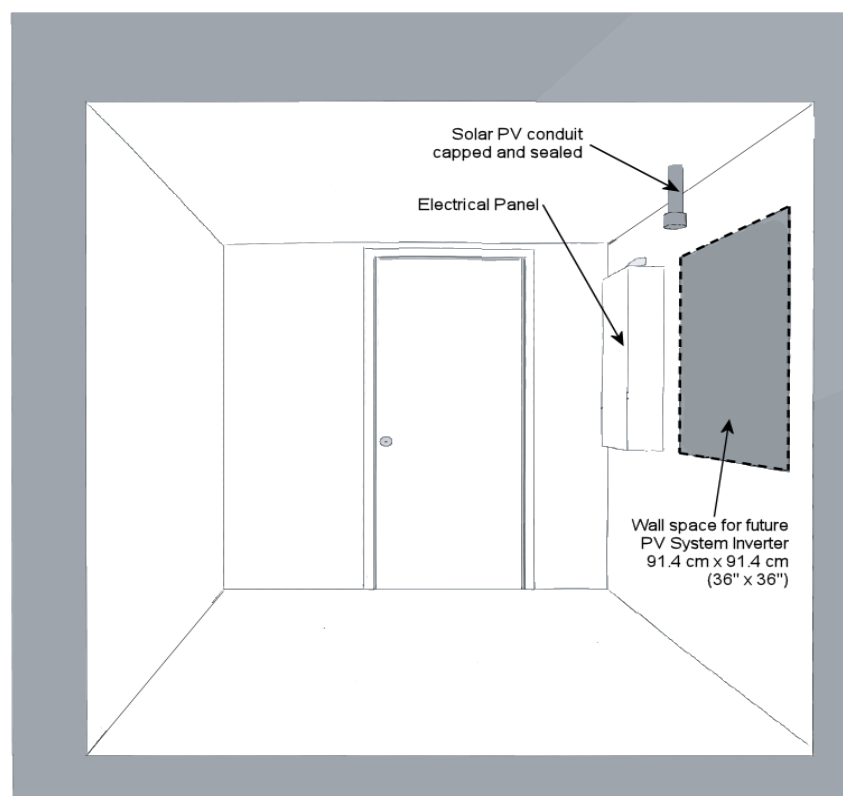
Allocation of Wall Space and termination of the Solar PV conduit adjacent to the Main Electrical Panel
